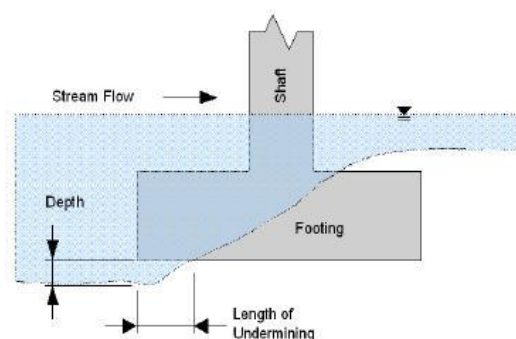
Longitudinal Cross Section Illustrating Undermining
